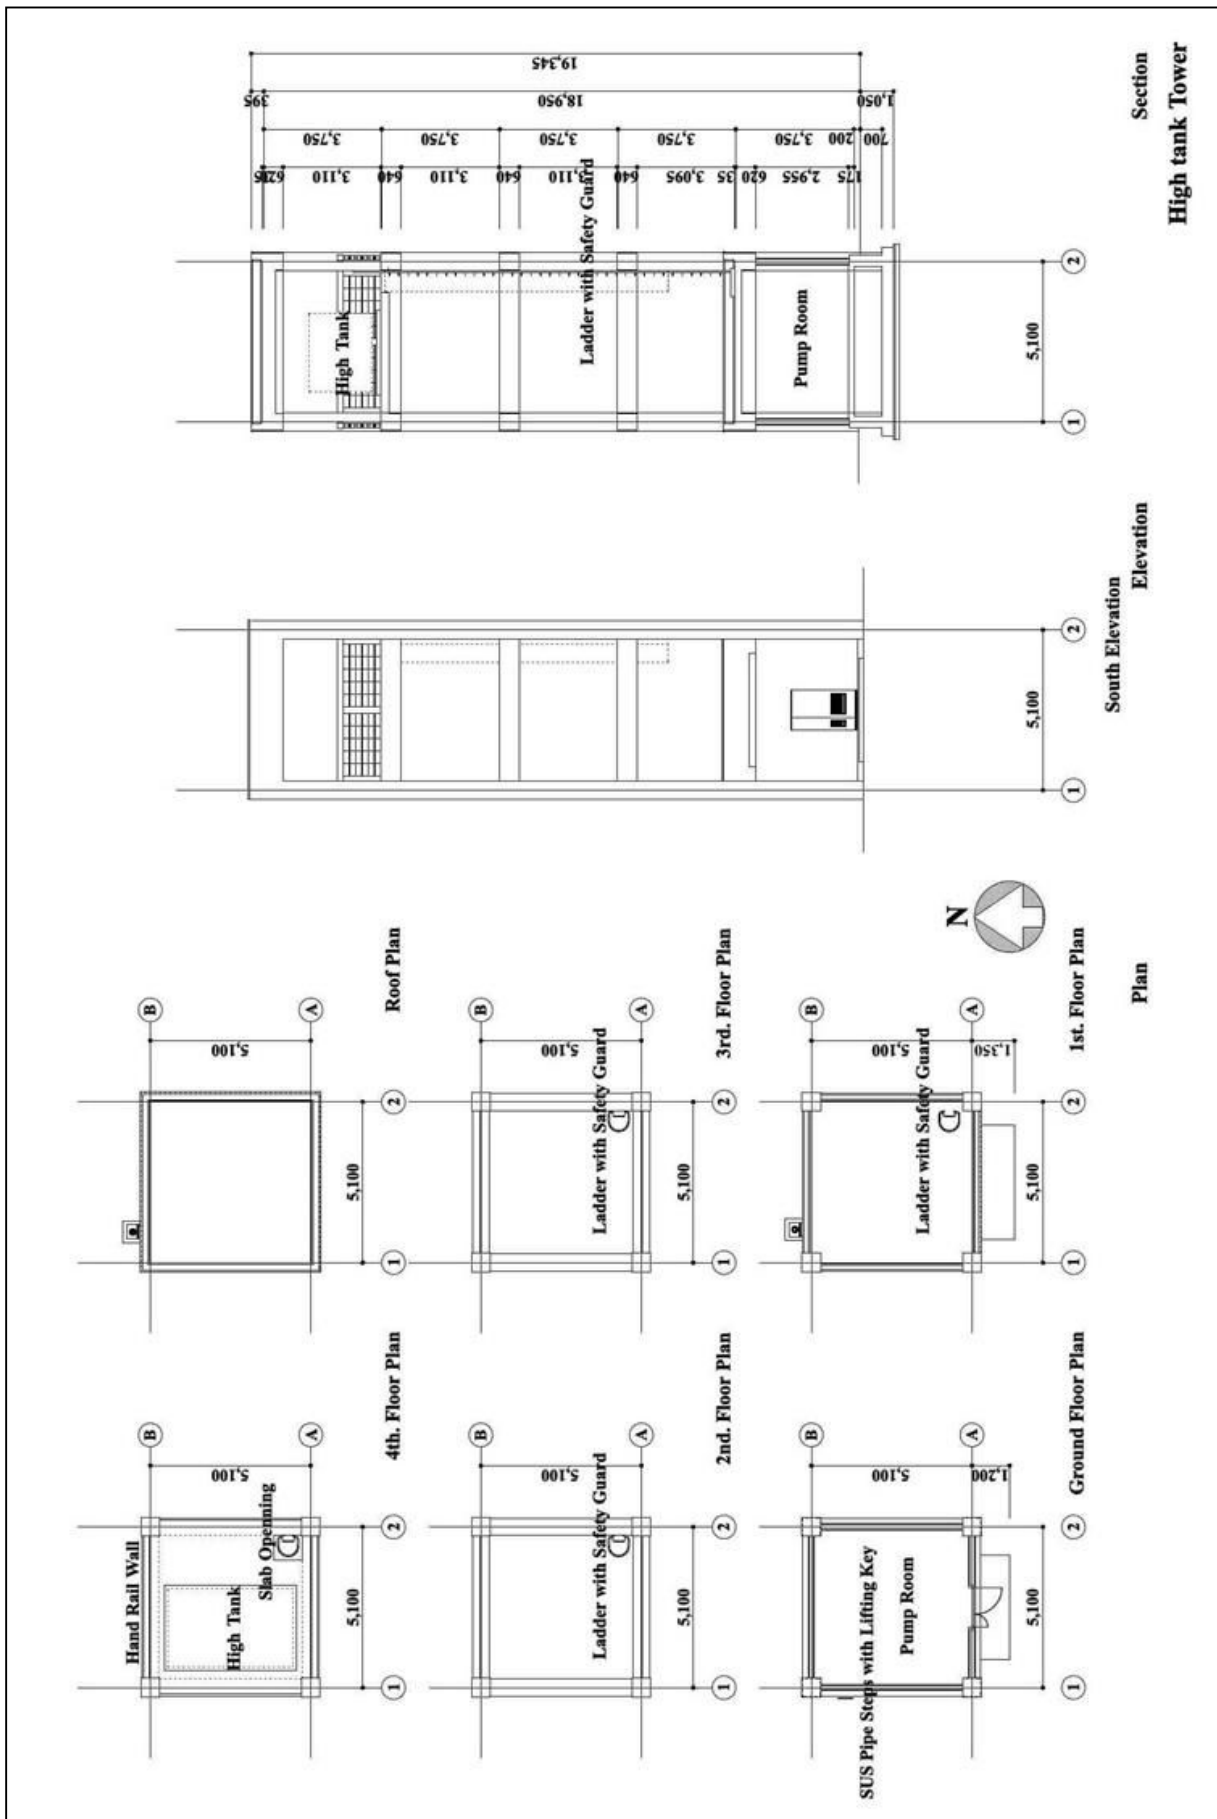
(11) Layout, Sectional Plan and Elevation of High Tank Tower
